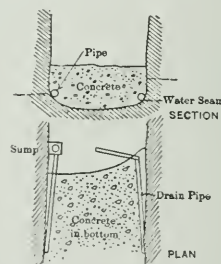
Second Method of Handling Water in Core-Wall Ditch.
